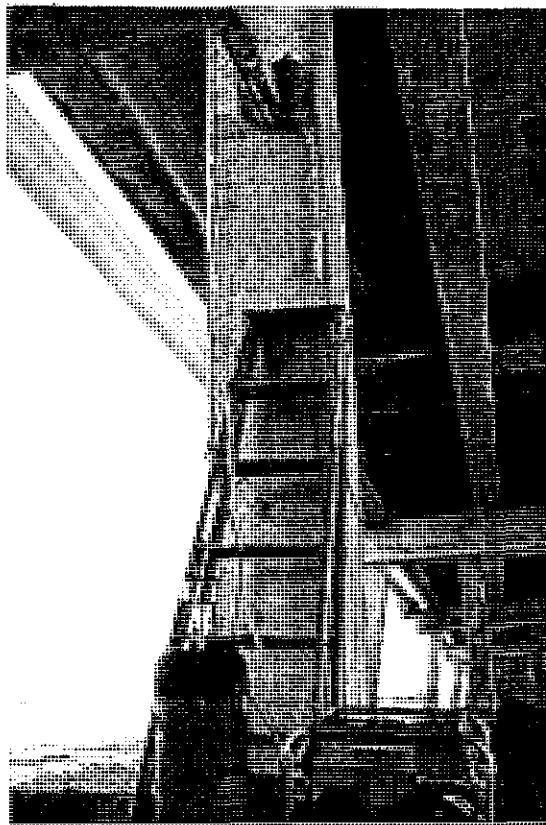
Coring equipment set up at 10 ft. above high tide on a prestressed pile of the south bound Boca Chica Bridge located at the Florida Keys.
